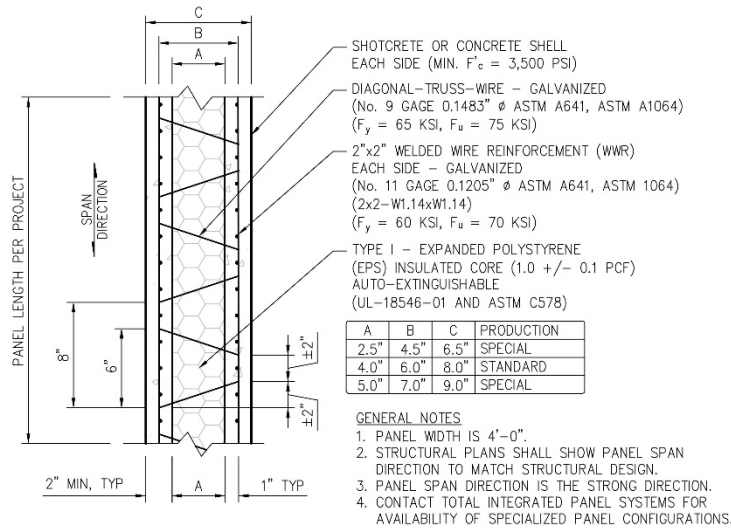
TIPS PANEL TYPES - SECTION VIEW
